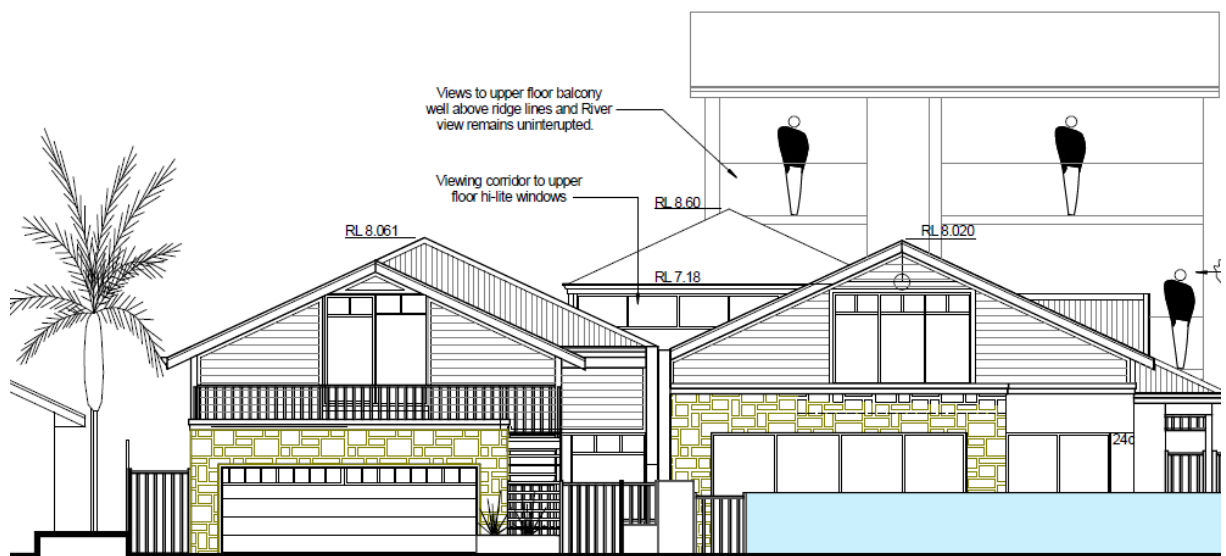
Drawing with proposed dwellings on the subject site superimposed demonstrating the impacts on No. 47 and No. 49 Letchworth Centre Avenue.
